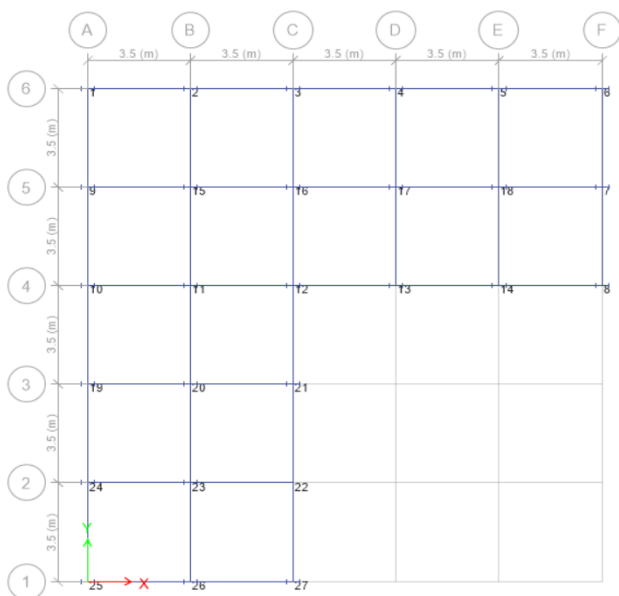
Plan View of a Three Storied L Shaped Building with External Floating Column
